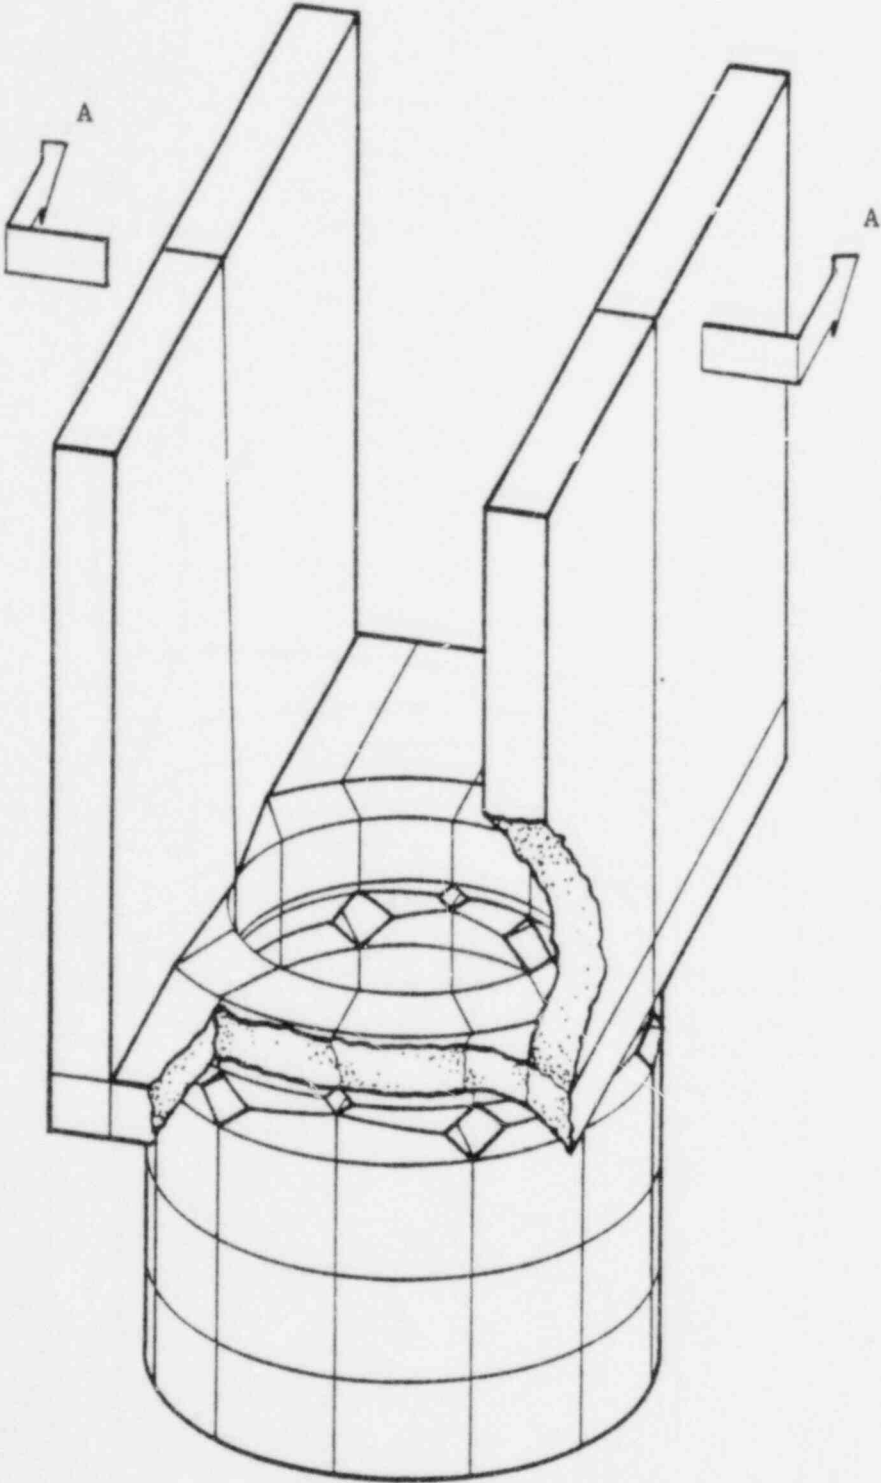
Crystal River 3 Cavity Wall Model, Section A-A
